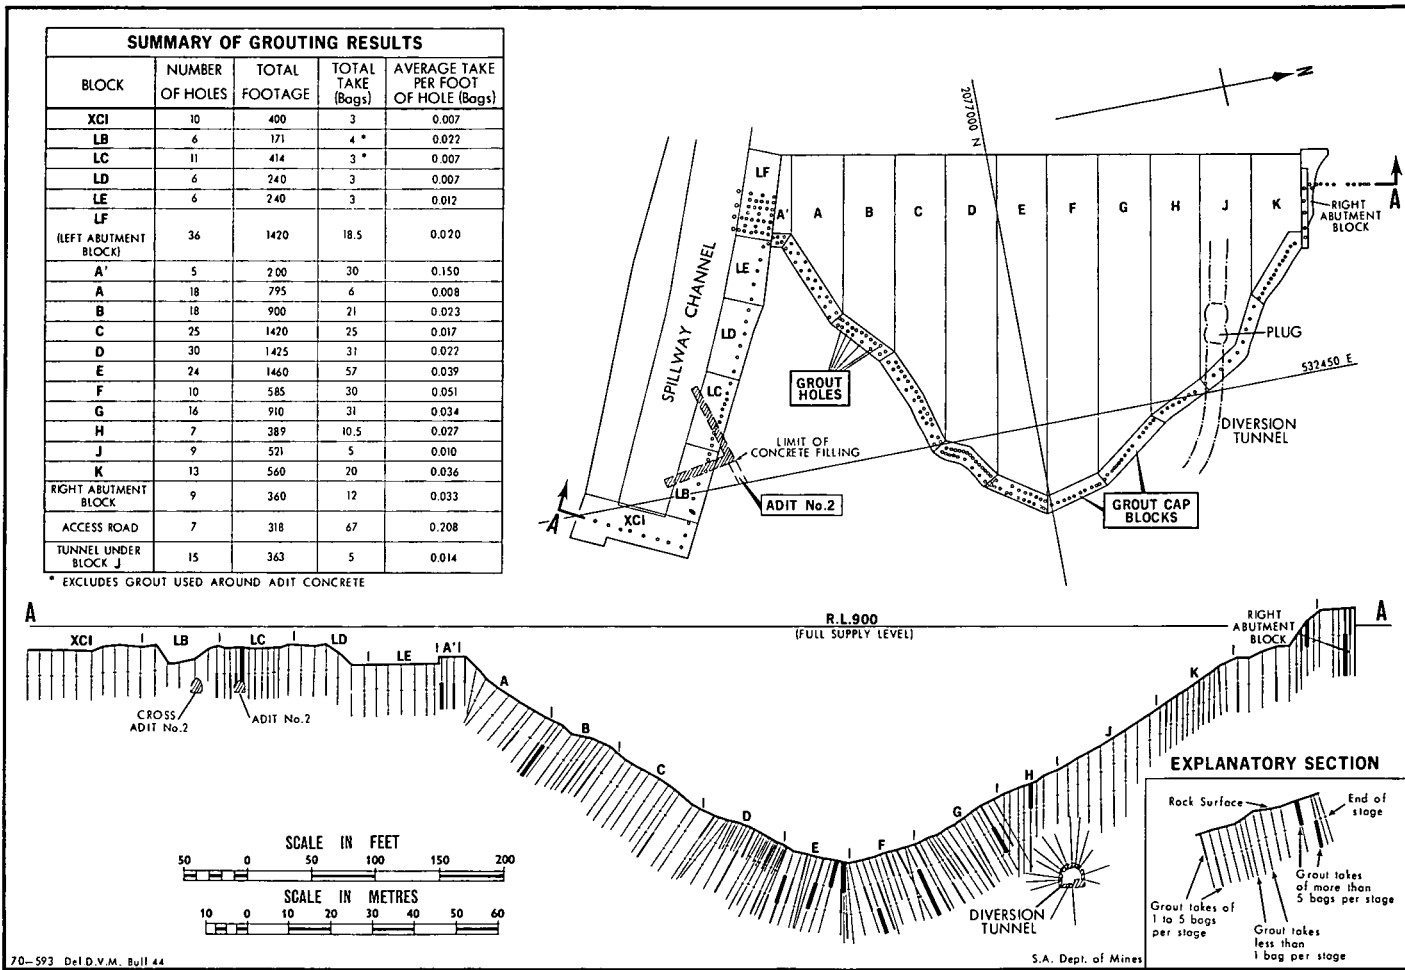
Distribution of grout holes; plan and section, also summary of grouting results.
